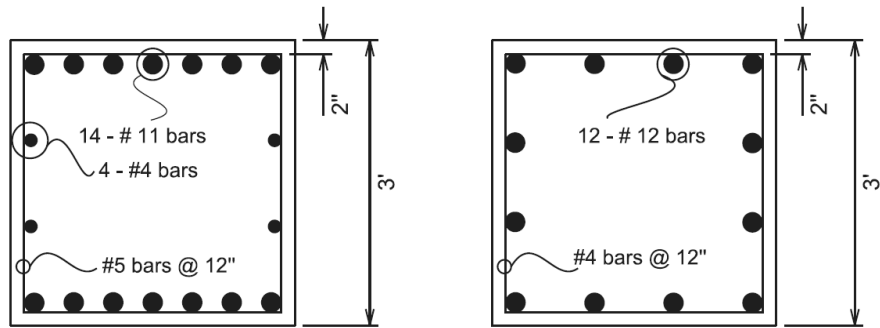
Cross-Sectional Layout for Bent Beam and Column for Multi-Span Continuous Steel Girder Bridge.
